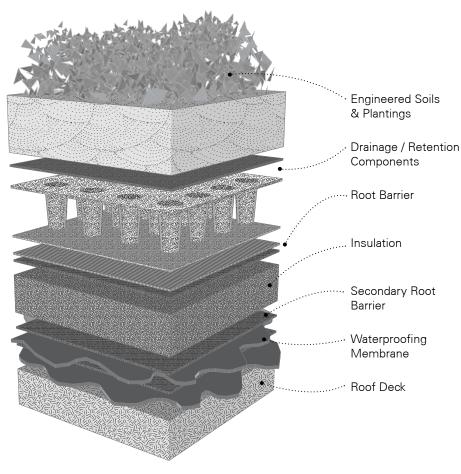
B Typical Roofing System Components *Adapted from Henshell (2005a).* • Avoid unplanned penetrations of the roofing system, for example by utility conduits. Flashing systems utilized need to avoid seams.
